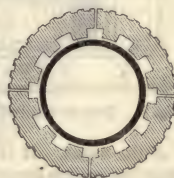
Ribbed-tile Protection. Cylindrical Column
